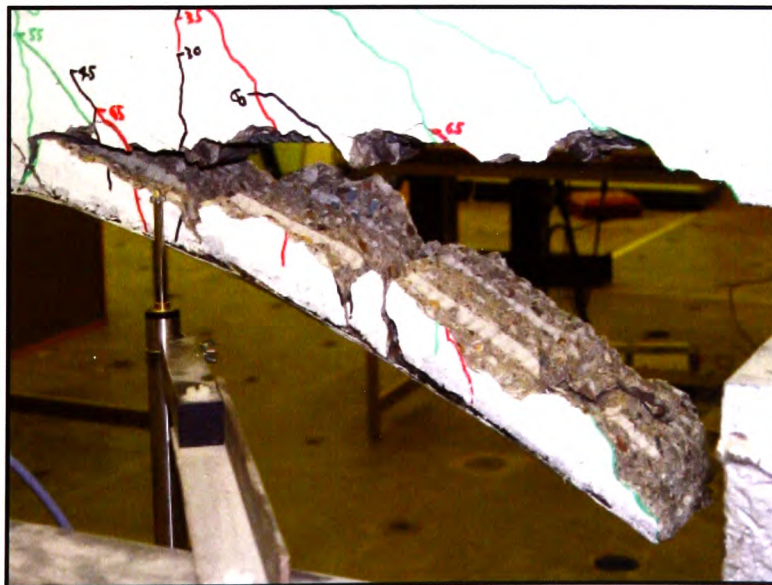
(b) – Element failure due to partial tearing-off of concrete cover caused by shear cracking at end of FRP composites sheet
